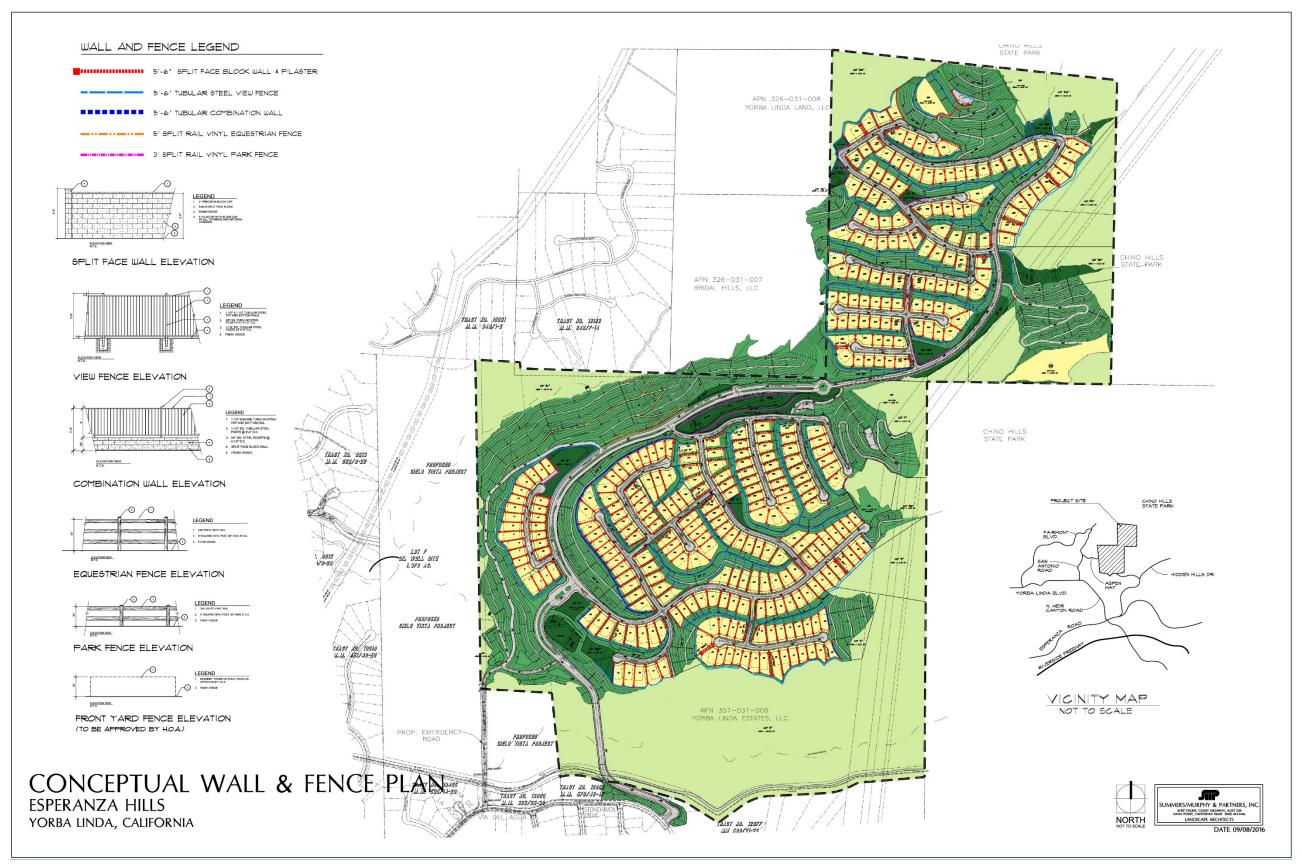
Exhibit 22 - Conceptual Wall and Fence Plan, San Antonio Road Access Configuration
